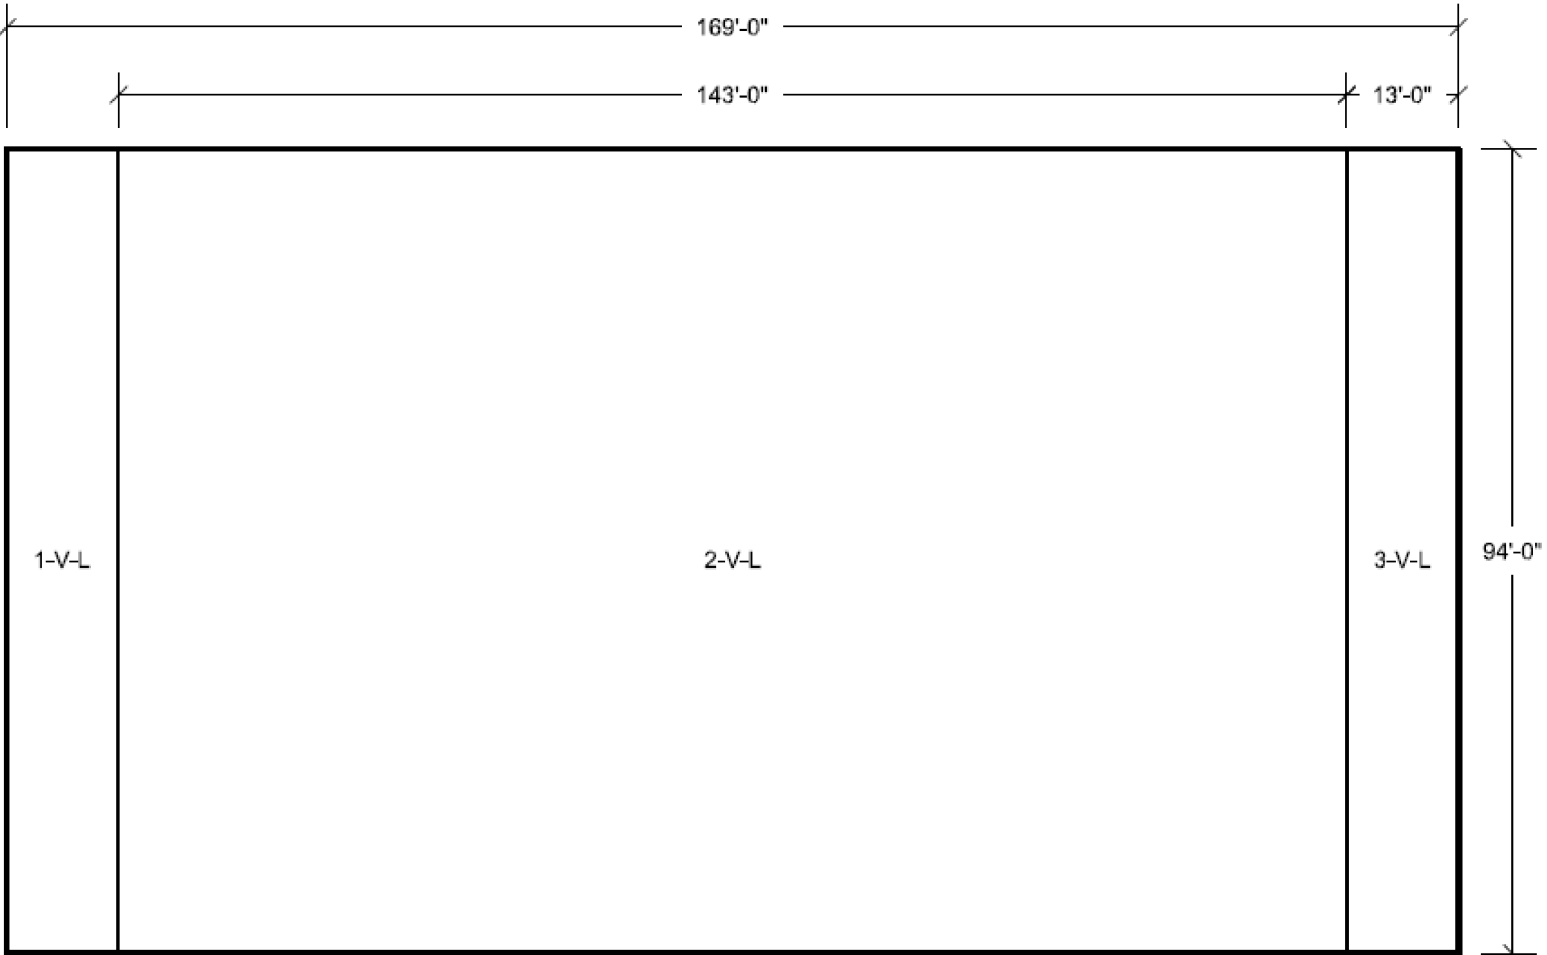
H.6-126 Pump House Foundation Mat North/South Reinforcement Zones Bottom Face
